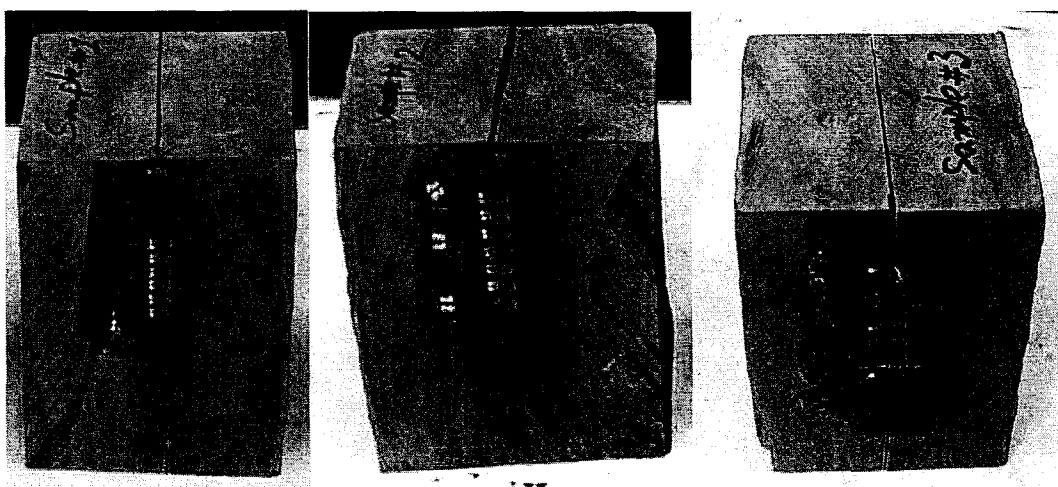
Impact splitting failure surfaces indicating crushing zone
